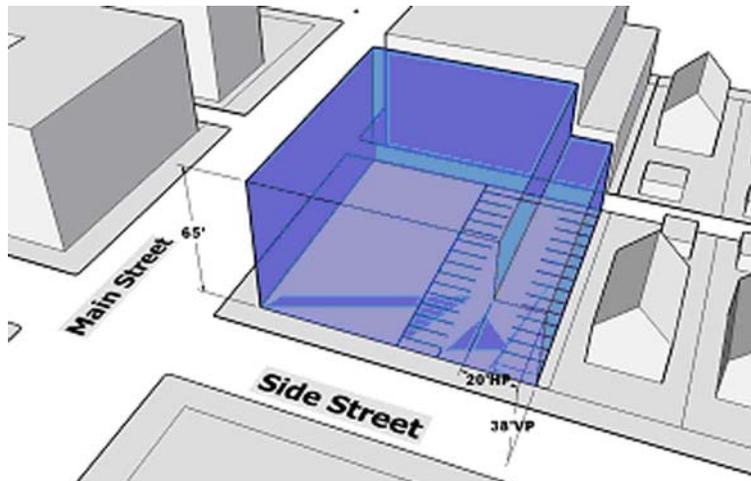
Maximum Building Height and Upper Story Setback (MS-2)
